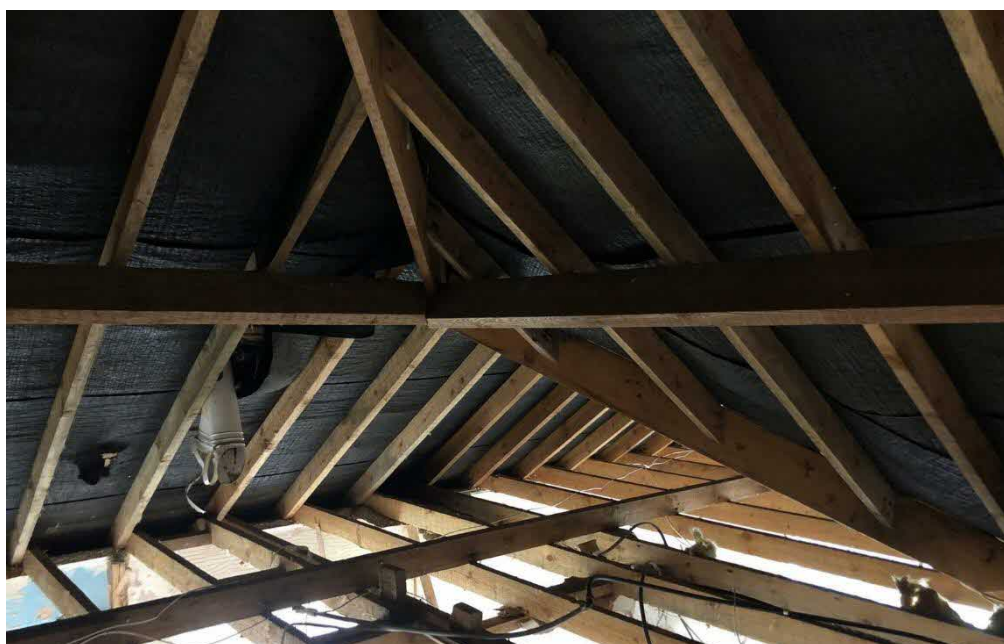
Interior of the roof space showing exposed ceiling joists and bitumen roof lining.
